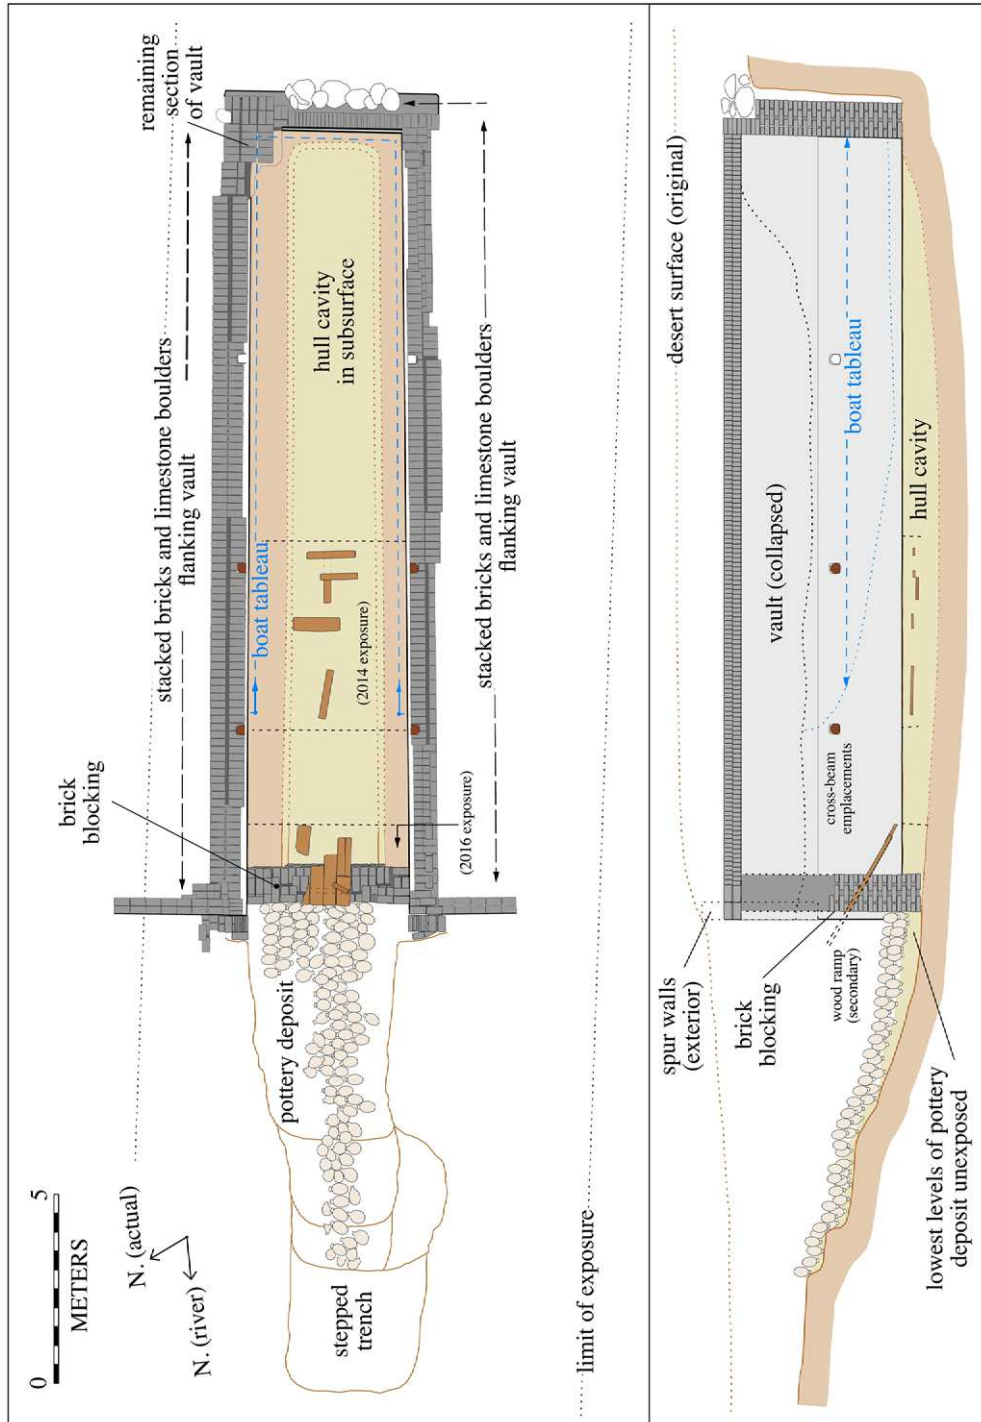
Top plan and longitudinal section of the boat building. (J. Wegner)
